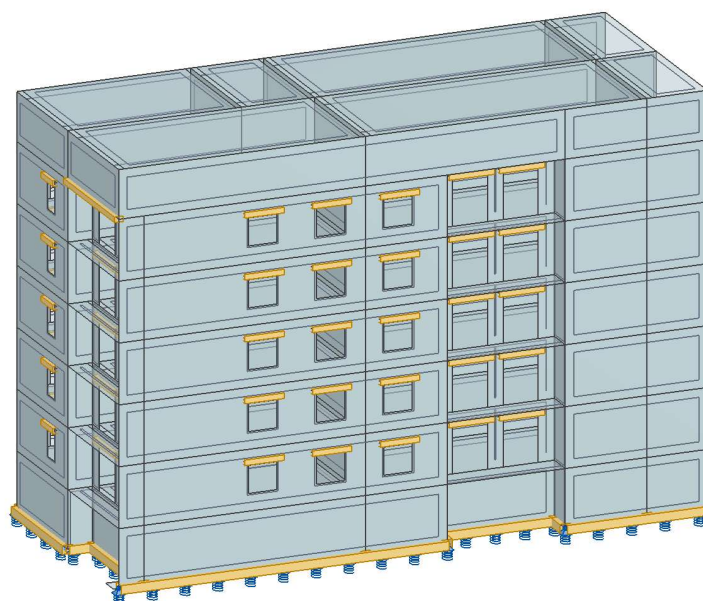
3D building’s analytical model (pile foundation is set as elastic bearing)
